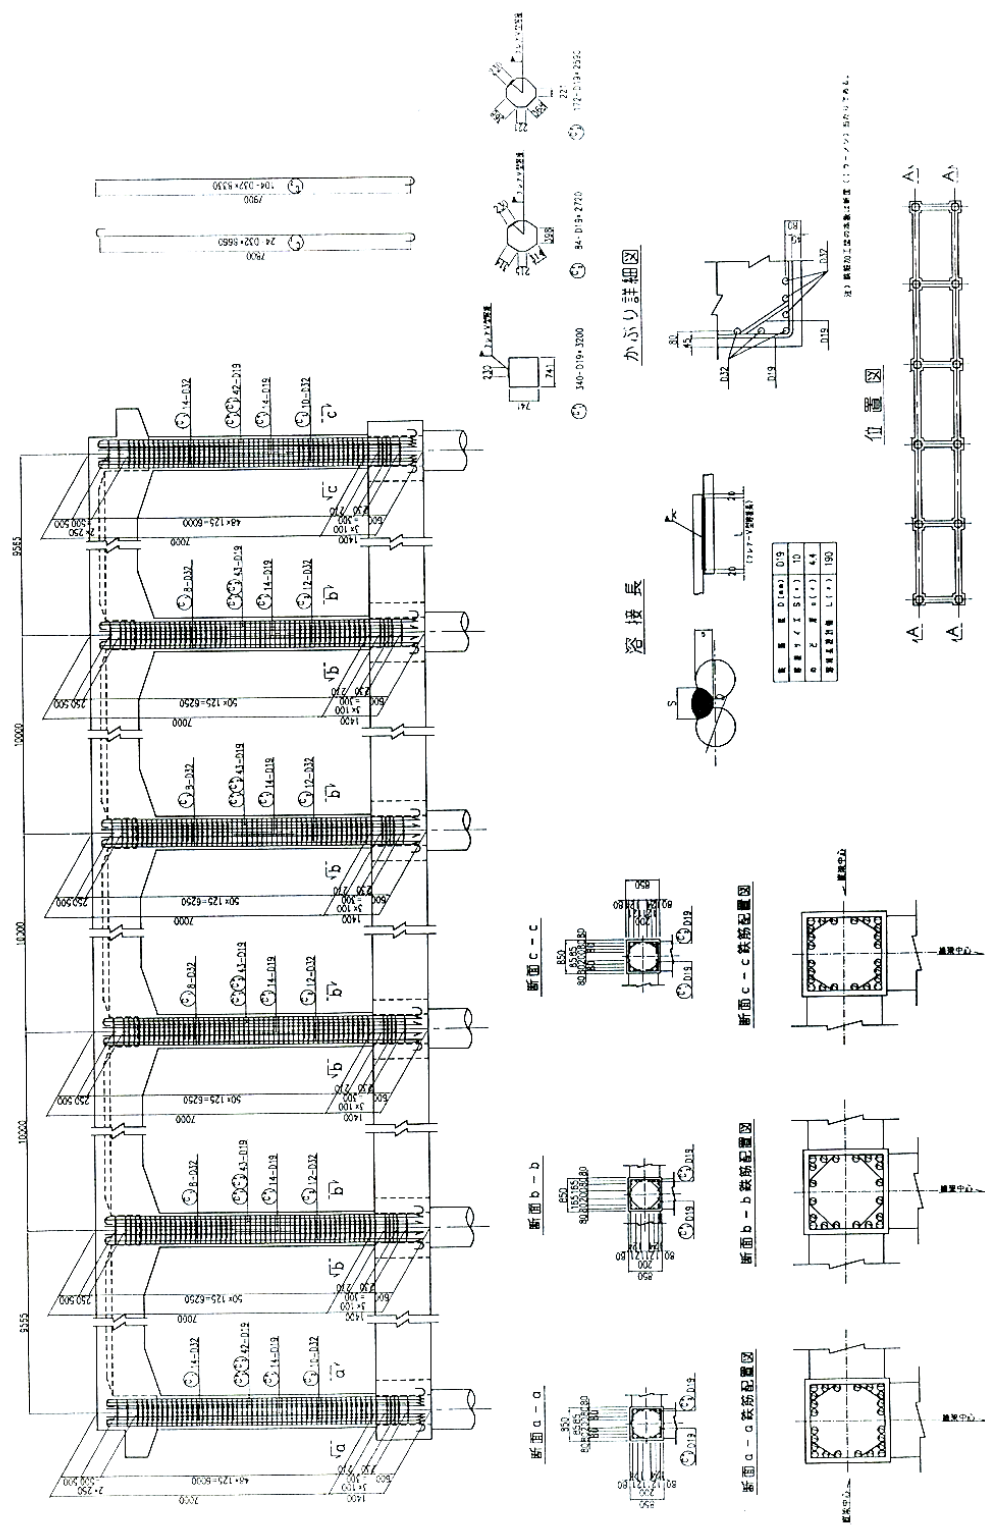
Steel rebar arrangement in column of rigid-framed railway bridge.
